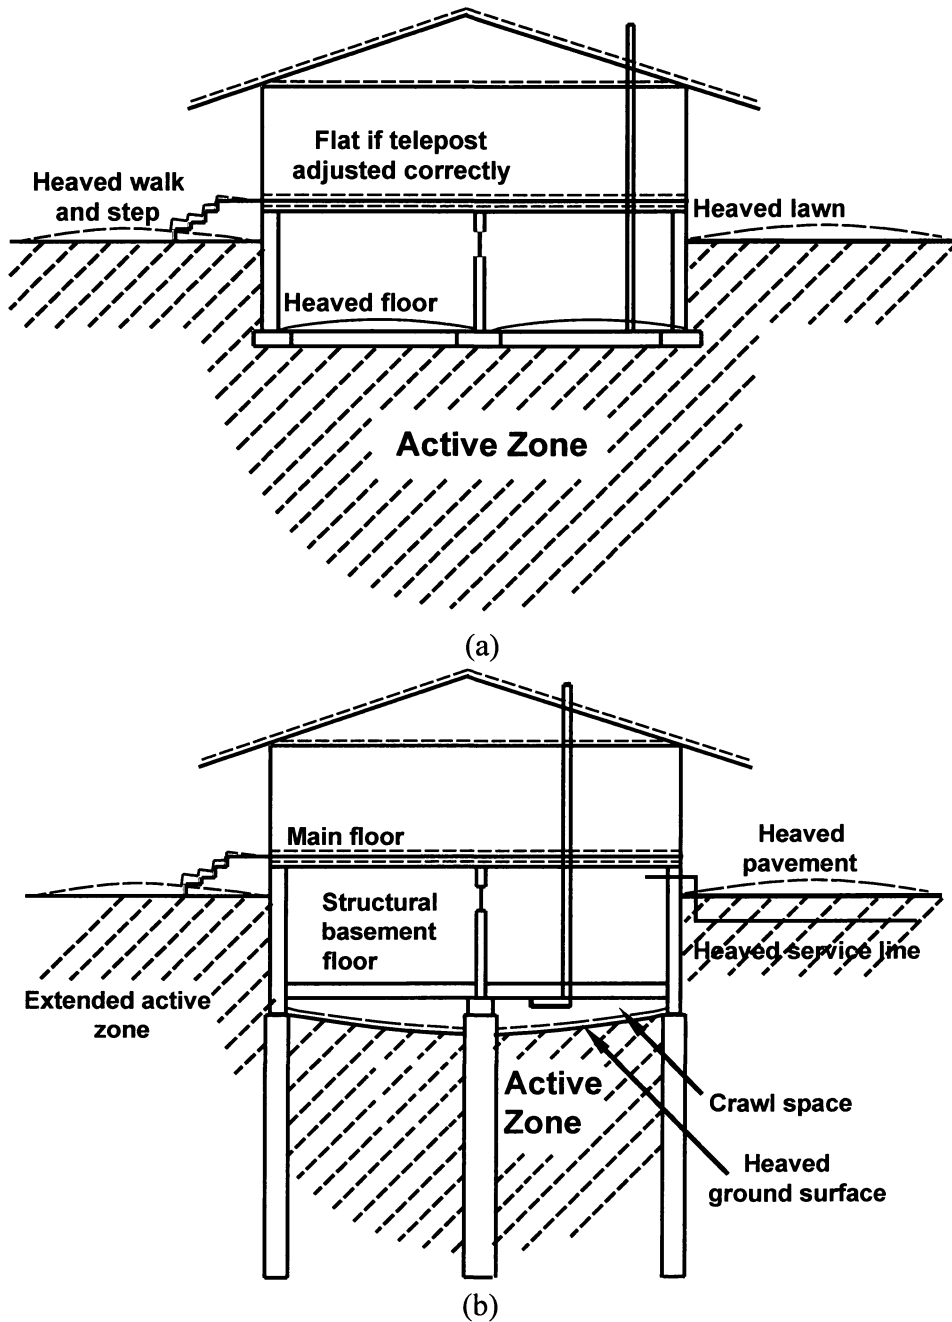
(a) Ground movements associated with the construction of shallow footings on an expansive soil. (b) Ground movements associated with the construction of a house founded on piles in expansive soils (Hamilton 1977).
